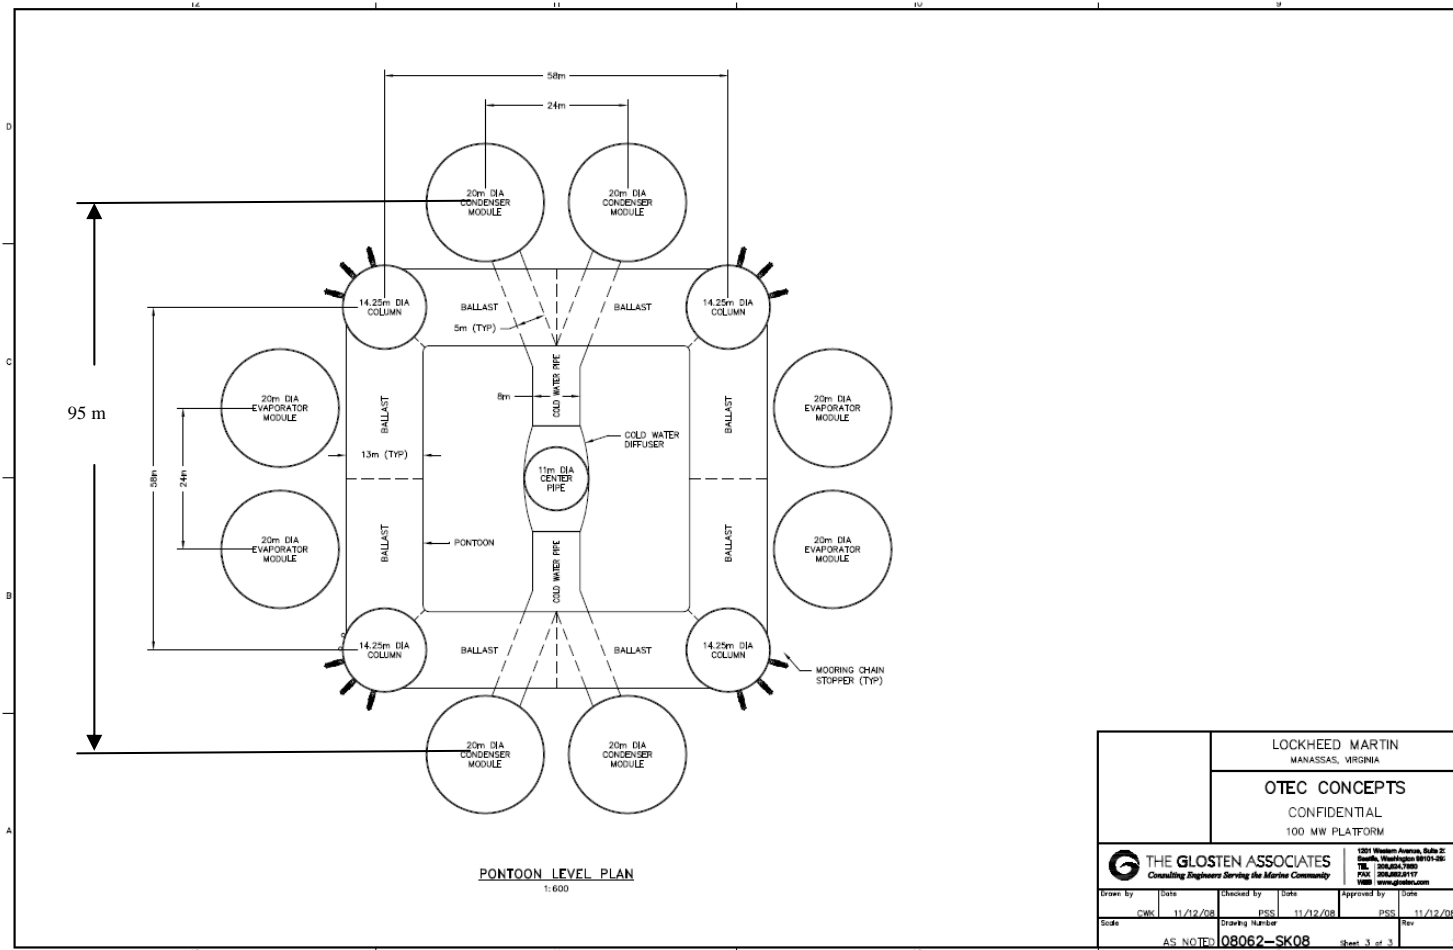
Pontoon Level Plan, 100 MW OTEC Platform
